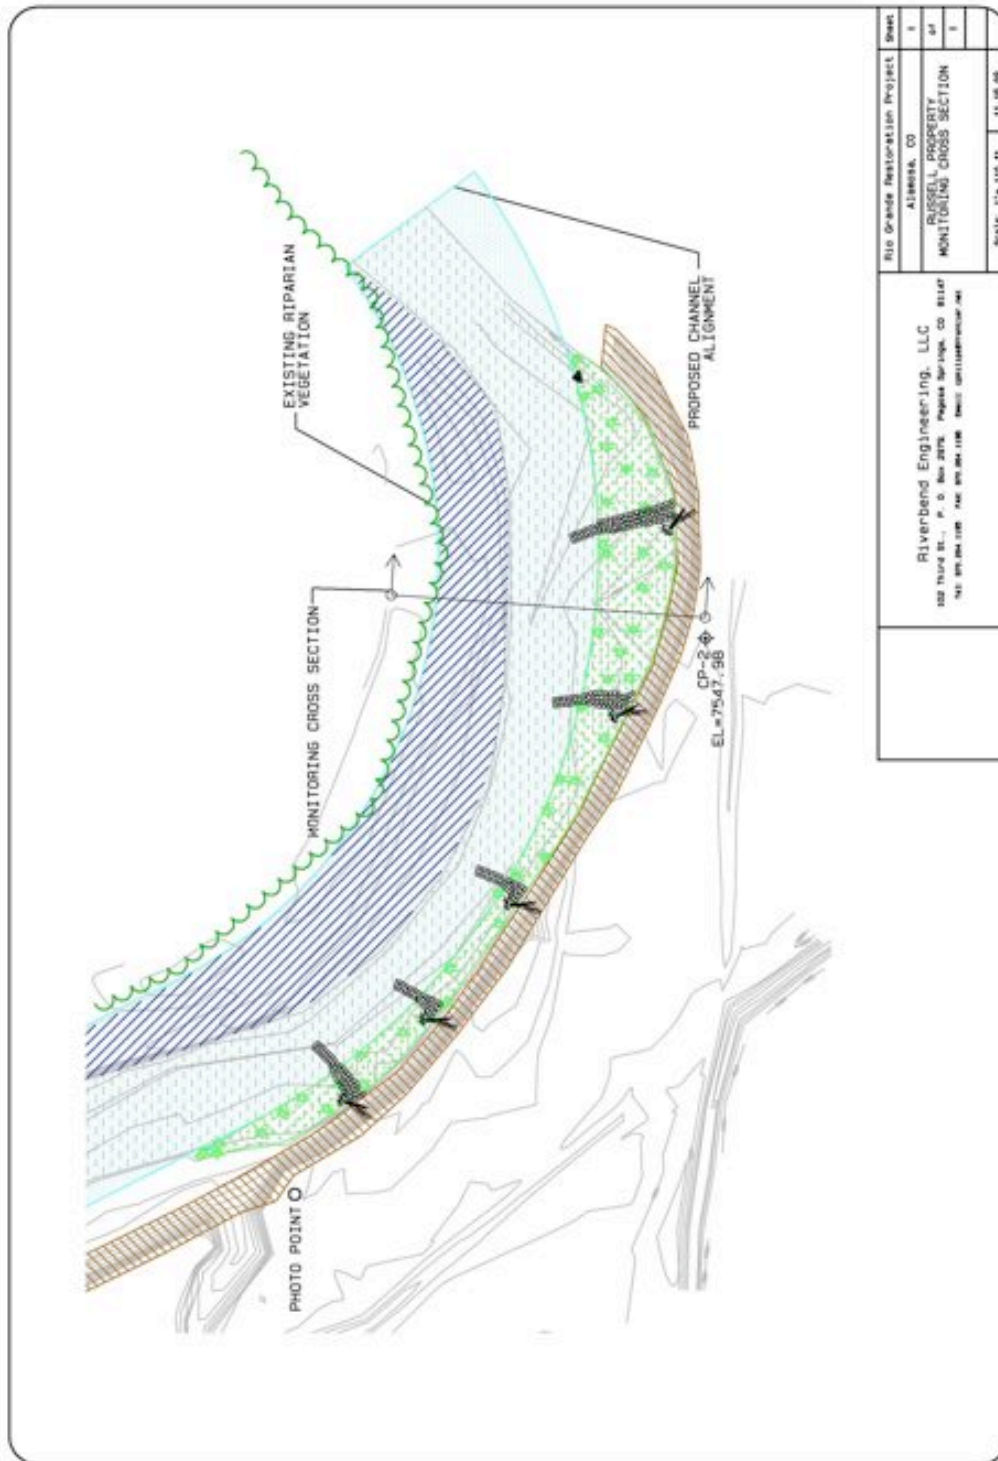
Russell Site Design, Cross Section Location, and Photopoint Location.
